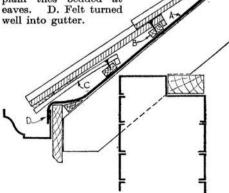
Courtrai-du-Nord tiling on OPEN BATTENING
